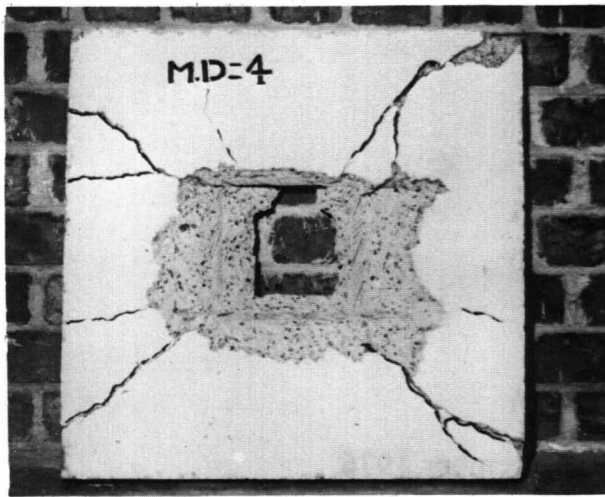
Figure I: Bottom of a reinforced concrete slab subjected to a central concentrated load.
